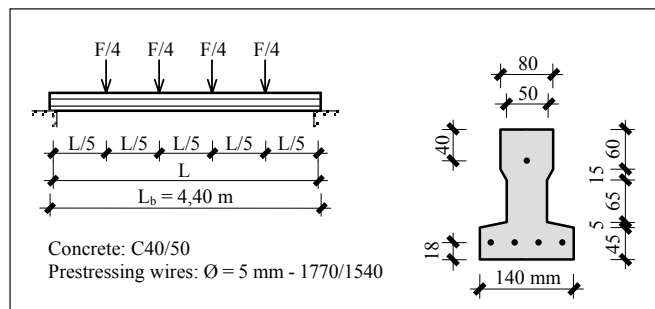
Bending test arrangement and cross-section of beam type EE-42
